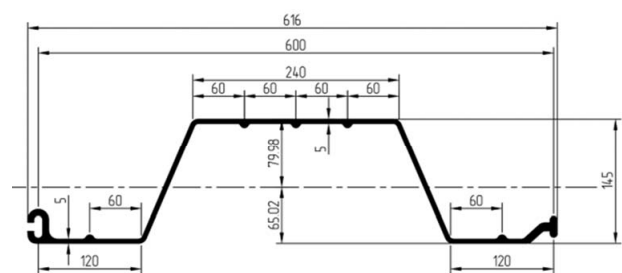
Cross-section of an individual element of a composite sheet pile of channel profile, grade ShK-150UM
